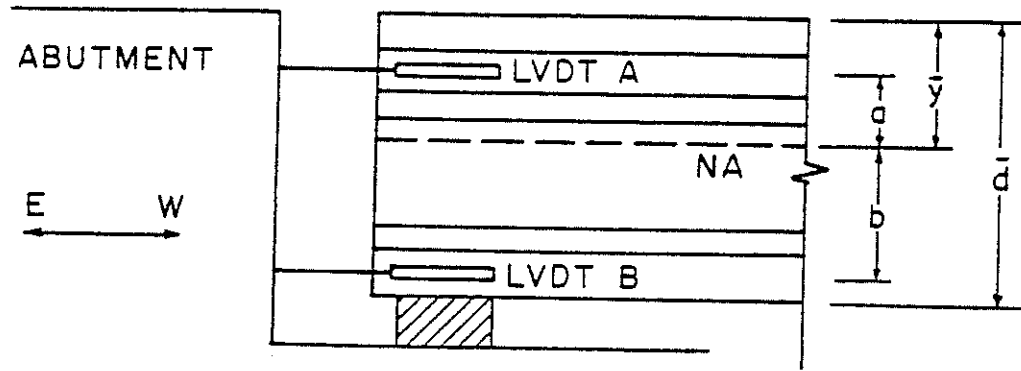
North Elevation of the Abutment Showing Measured Positions of LVDT's.
